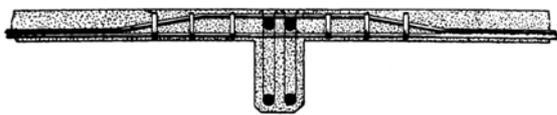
Reinforcement detail of T-beam design incorporated by Hennebique. (Mörsch)
